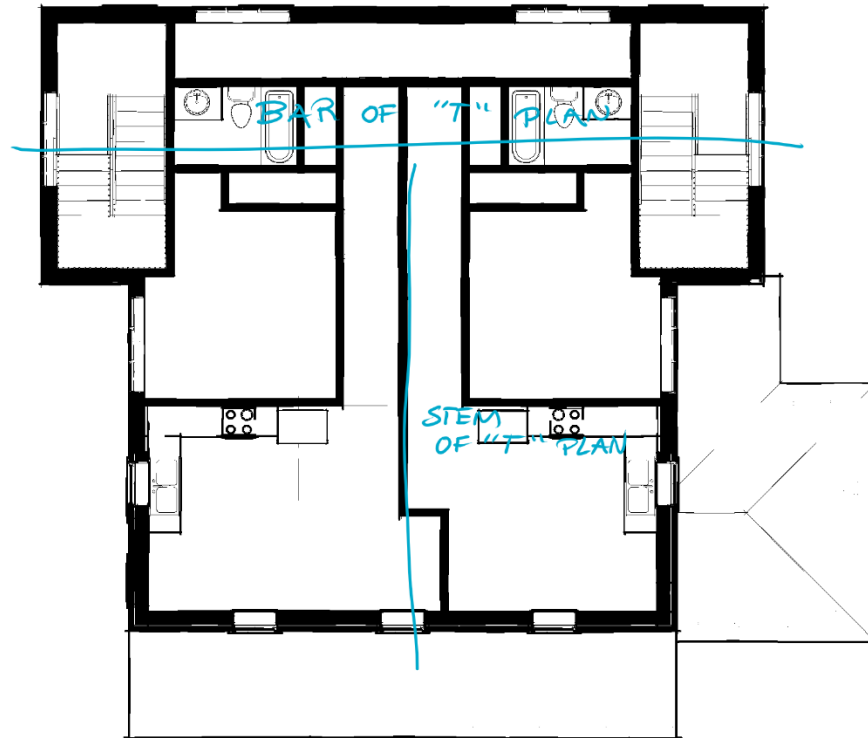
Conceptual Floor Plan showing T shape of the building footprint.
